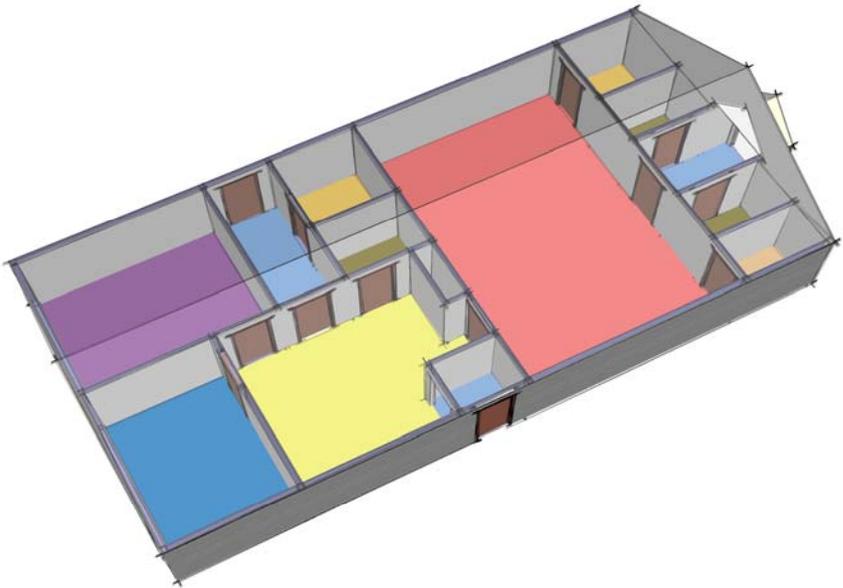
Existing Floor Plan Beaver Jutras Recreation Building
